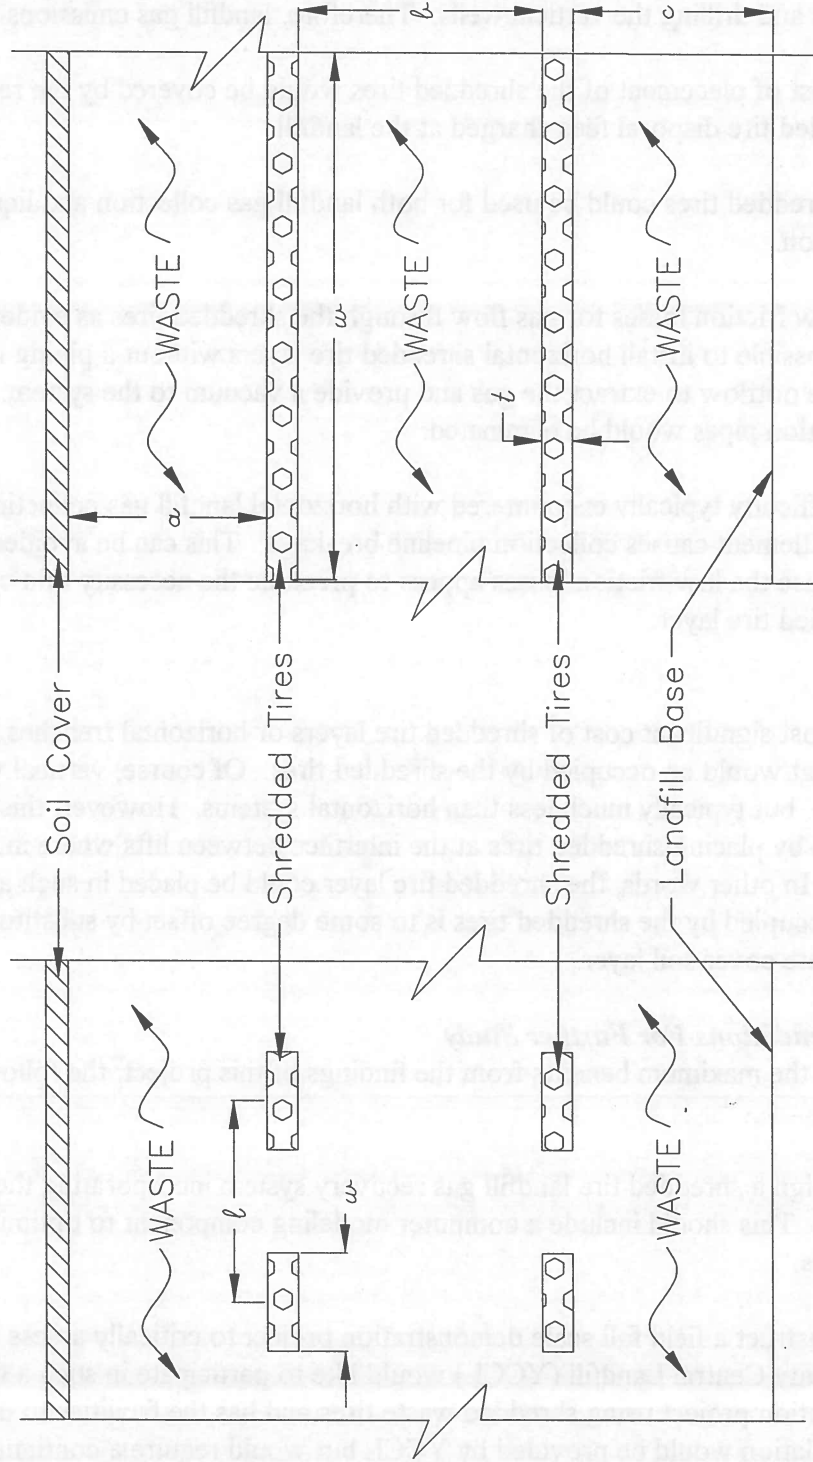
Definition Sketch: Potential Horizontal Landfill Gas Collection Layers – Section Views
